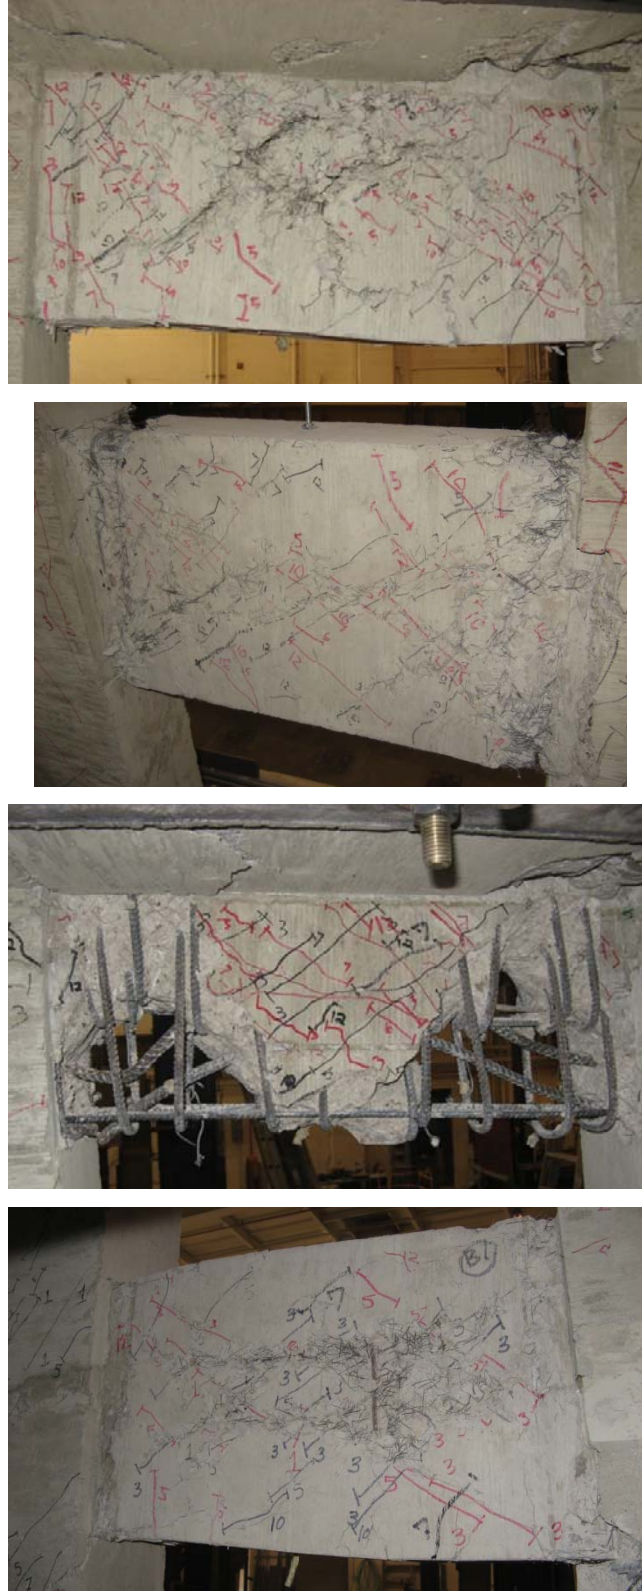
Damage state of coupling beams in Specimen CW-2 after testing. Coupling beams from story level four down to one are shown from top to bottom, respectively.
